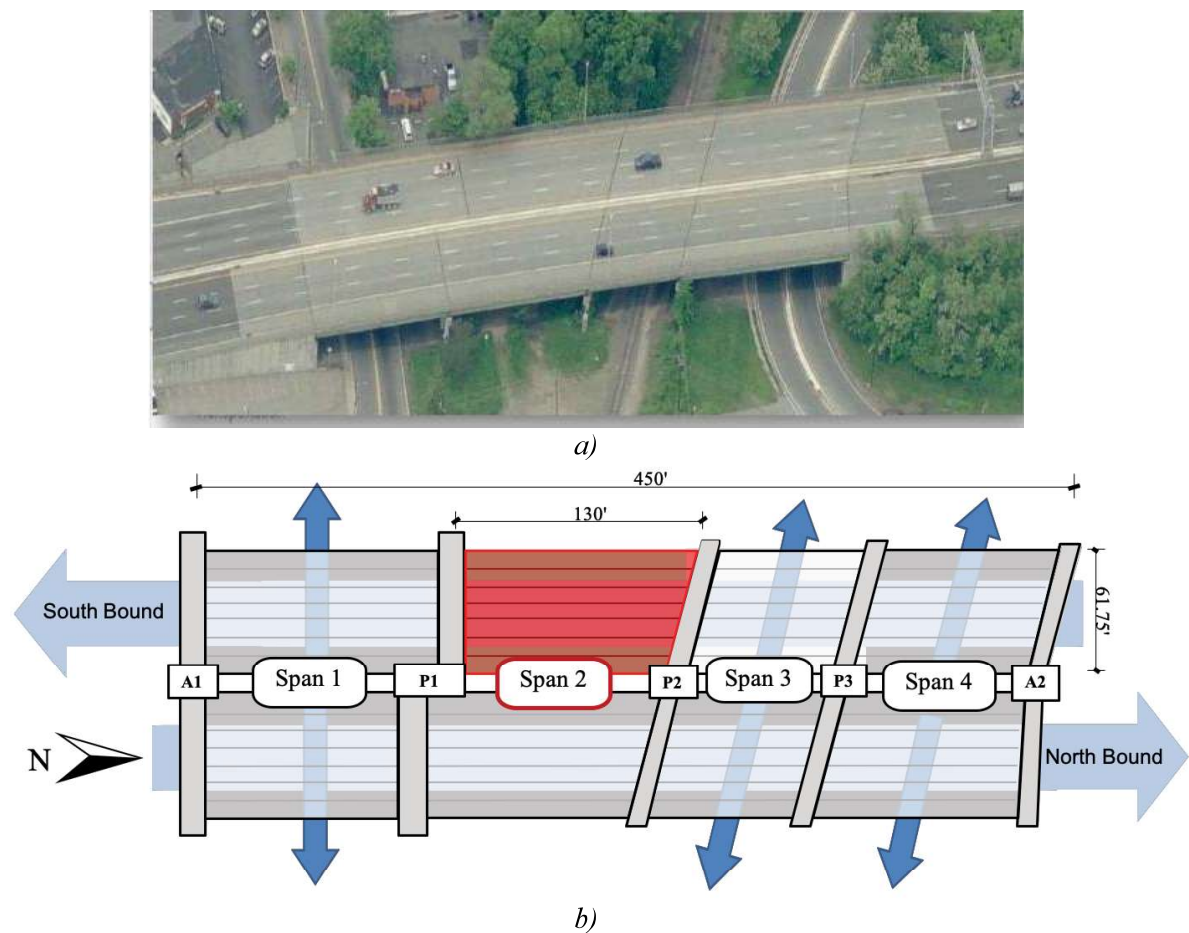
The selected bridge: a) view from Google Maps; b) site layout with Span 2 Southbound Highlighted
